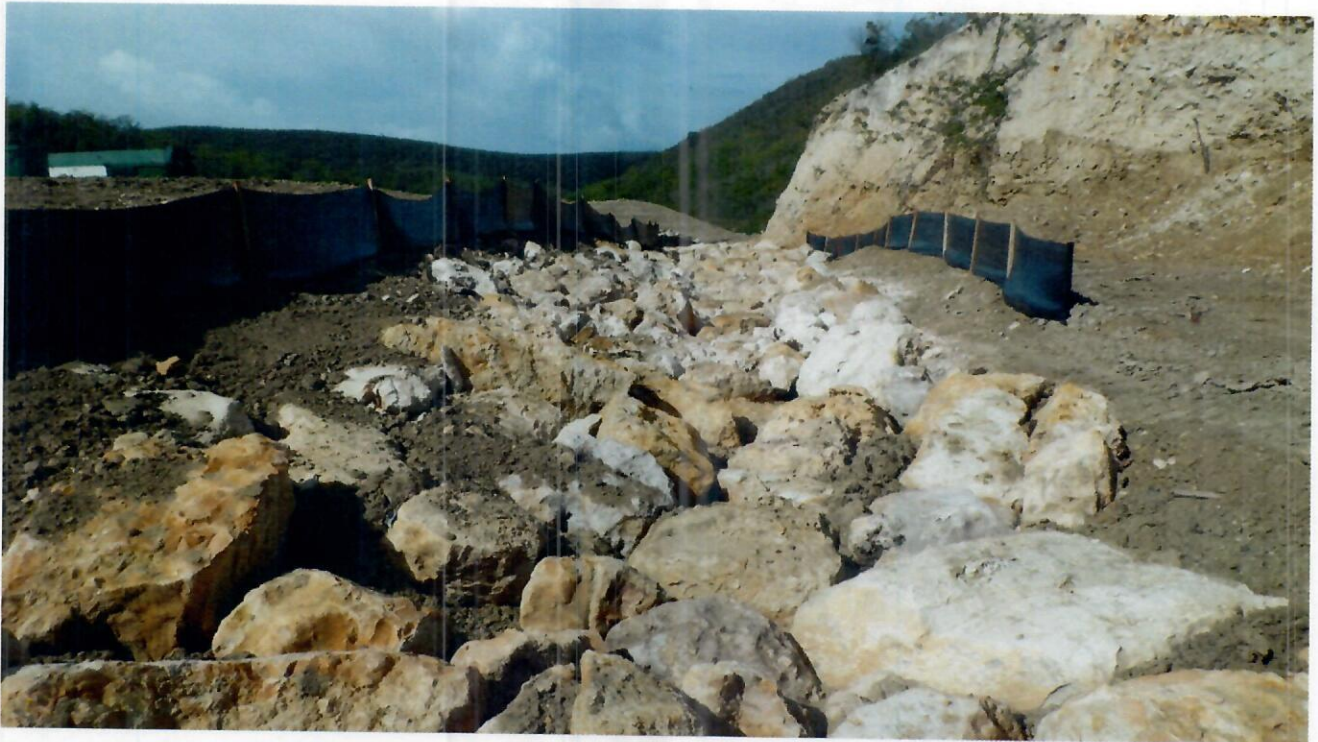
Drainage ditch lined with rocks and protected with silt fences.
